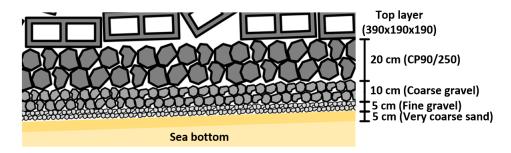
Side view of a block reef strip with top layer: 390x190x190 mm
